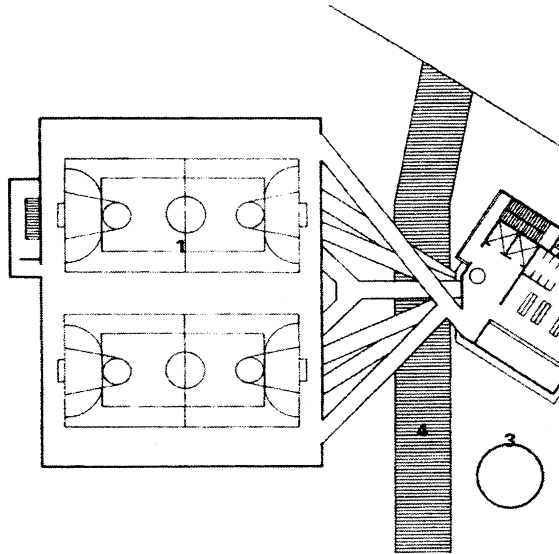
Bardi, SESC Pompéia, Detail of Ground Plan.
